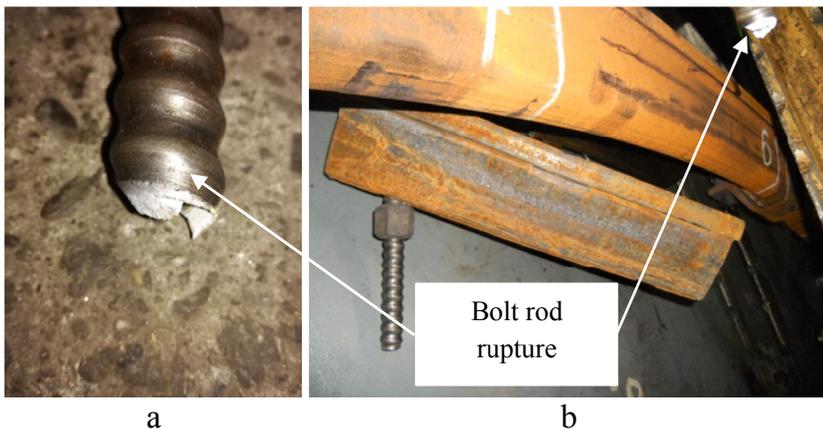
Post-test bolt rod failure: a, b – bolt rod rupture at the thread
